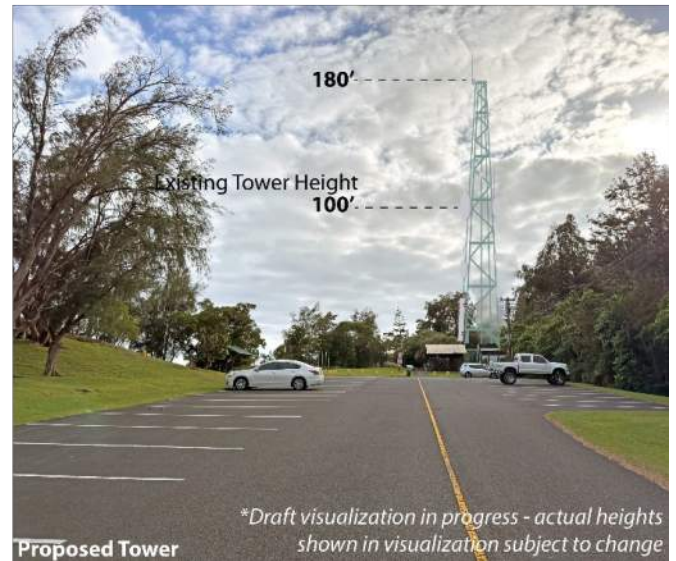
Photo of Existing Tower and Rendering of Proposed Tower, View Looking Mauka from Pu'u 'Ualaka'a Lookout
